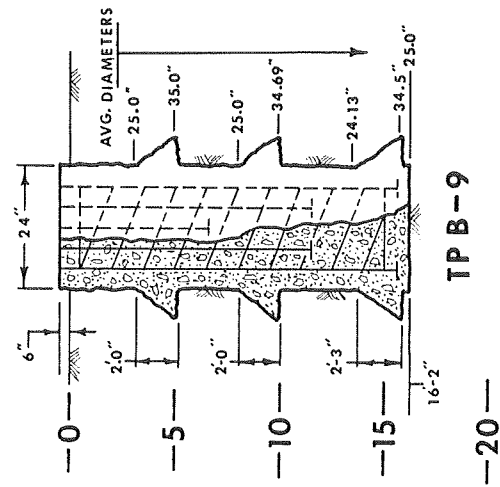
SCHEMATIC OF TEST PILES – SITE A
